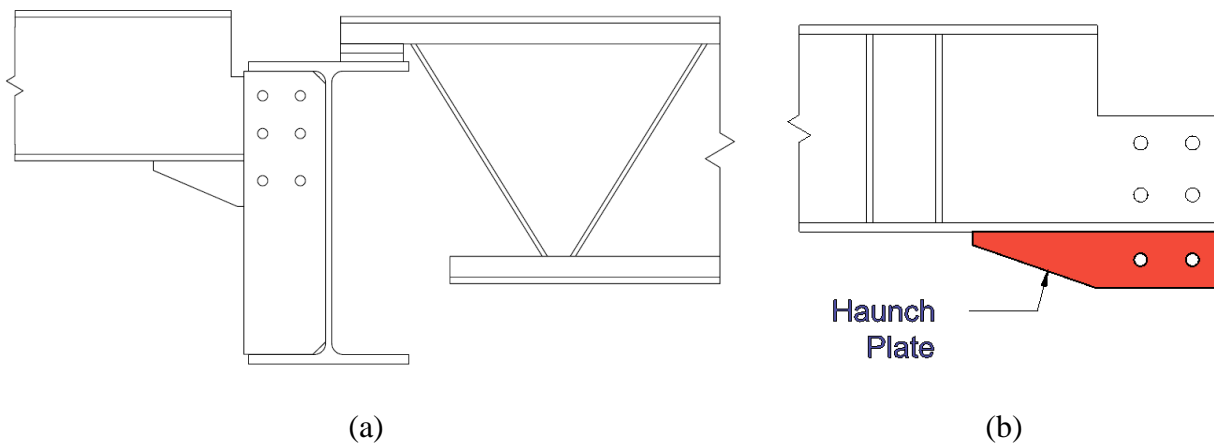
(a) Haunch beam with open web steel joist (OWSJ), (b) coped haunched beam
